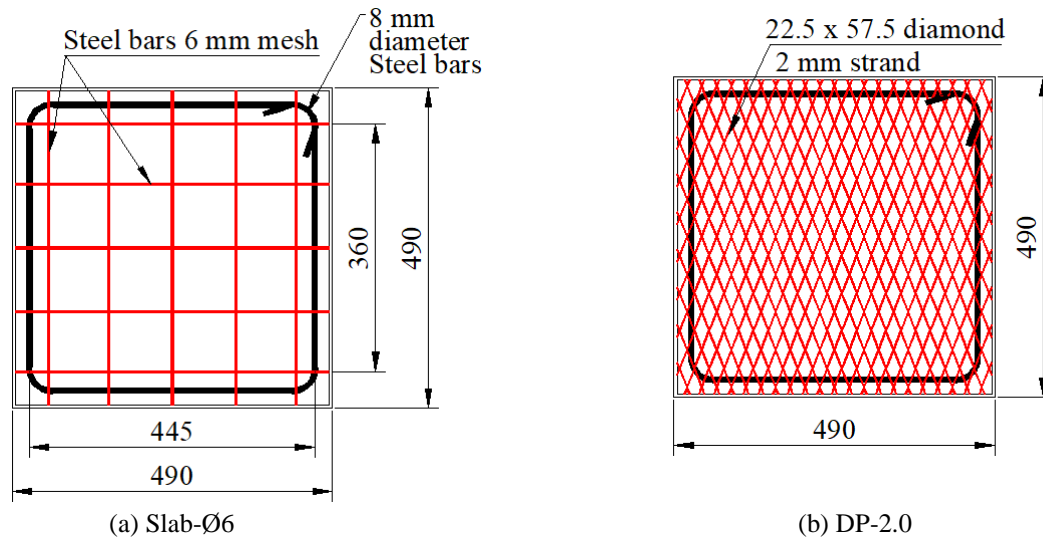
Specimens dimensions and reinforcement details of the slabs (Ibrahim, 2011)
